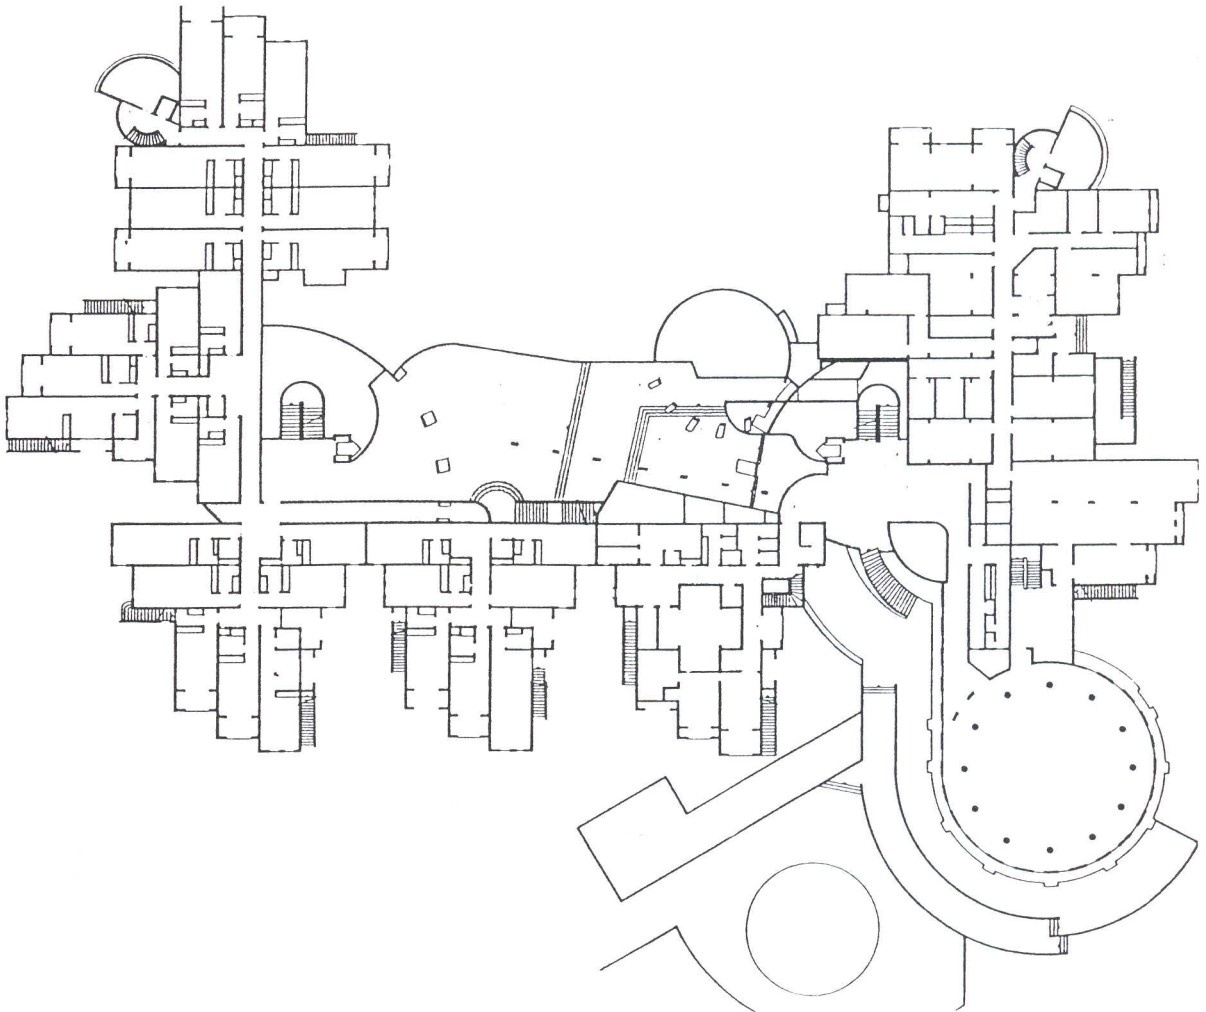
The Peritower Hotel, Plan (Source: Yapı 184, 1997)
